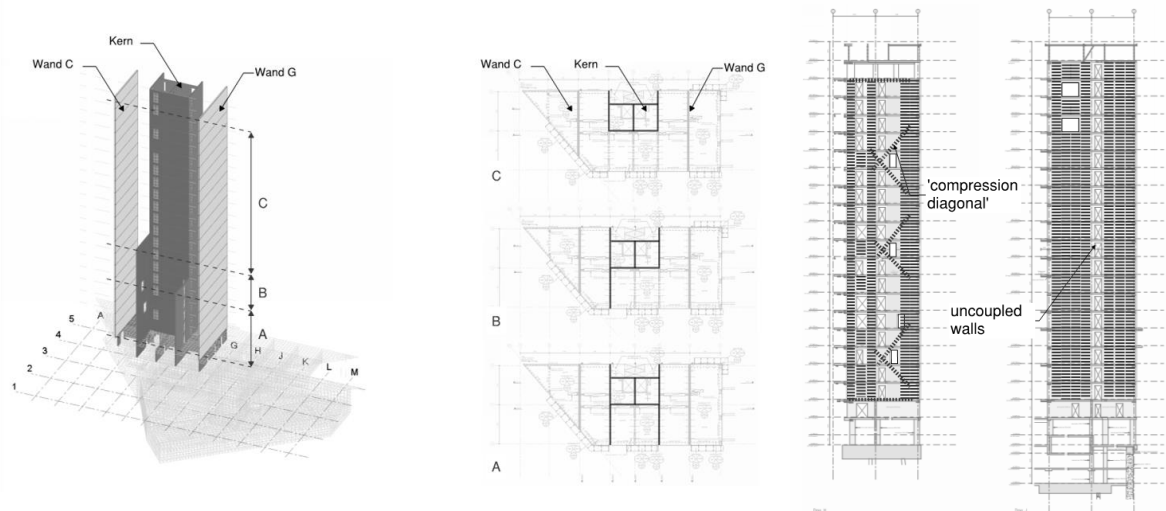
Lateral force resisting system (left) and elevation of CLT shear walls
